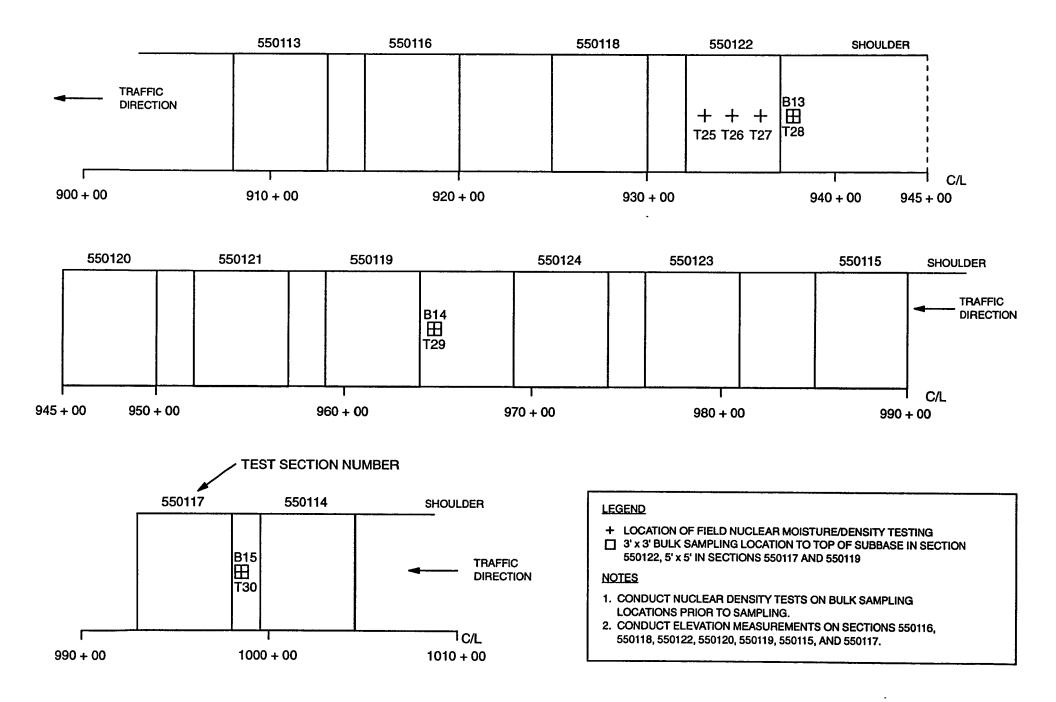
Overview of Sampling and Testing Plan for Existing Crushed Rock Base.
